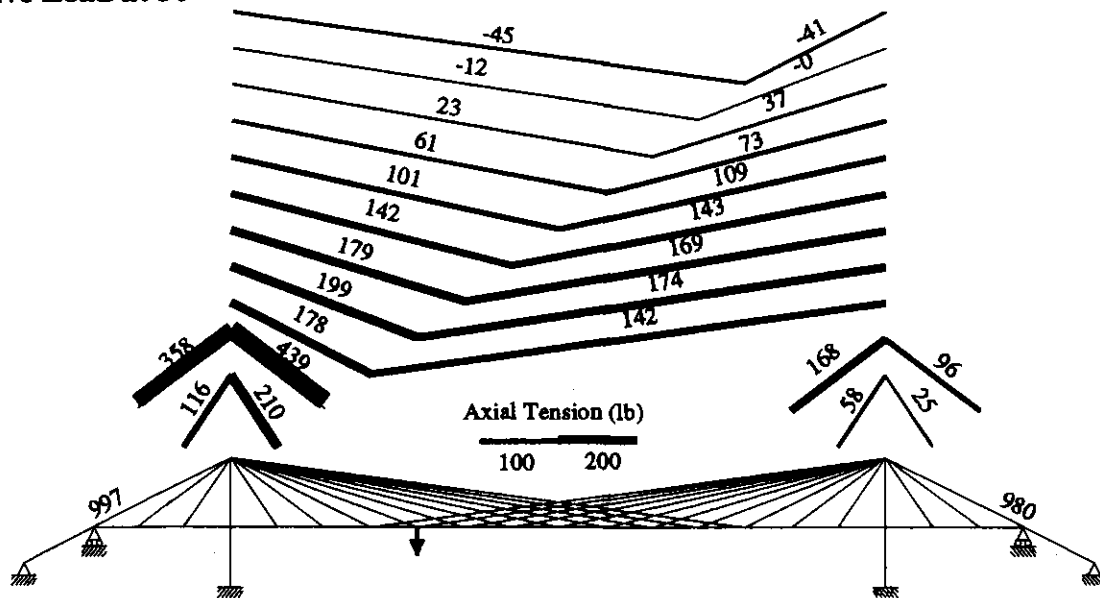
Live Load Forces and Deflections in Truss of Bluff Dale-Type Bridge with Crossing Fan Cable Pattern
